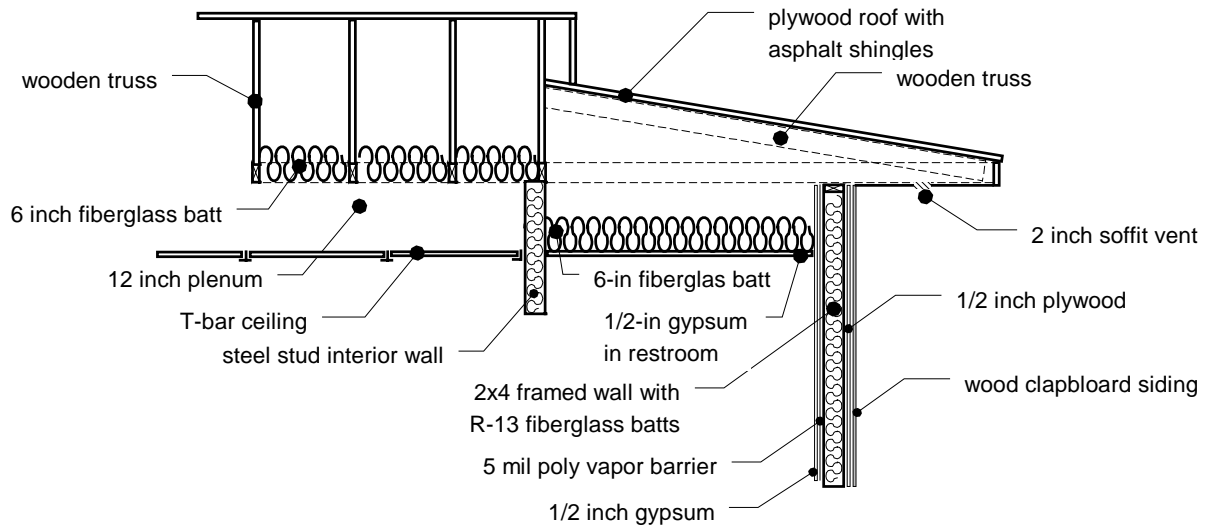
Roof and Wall Sections along the Length of the Office Section of the Building
